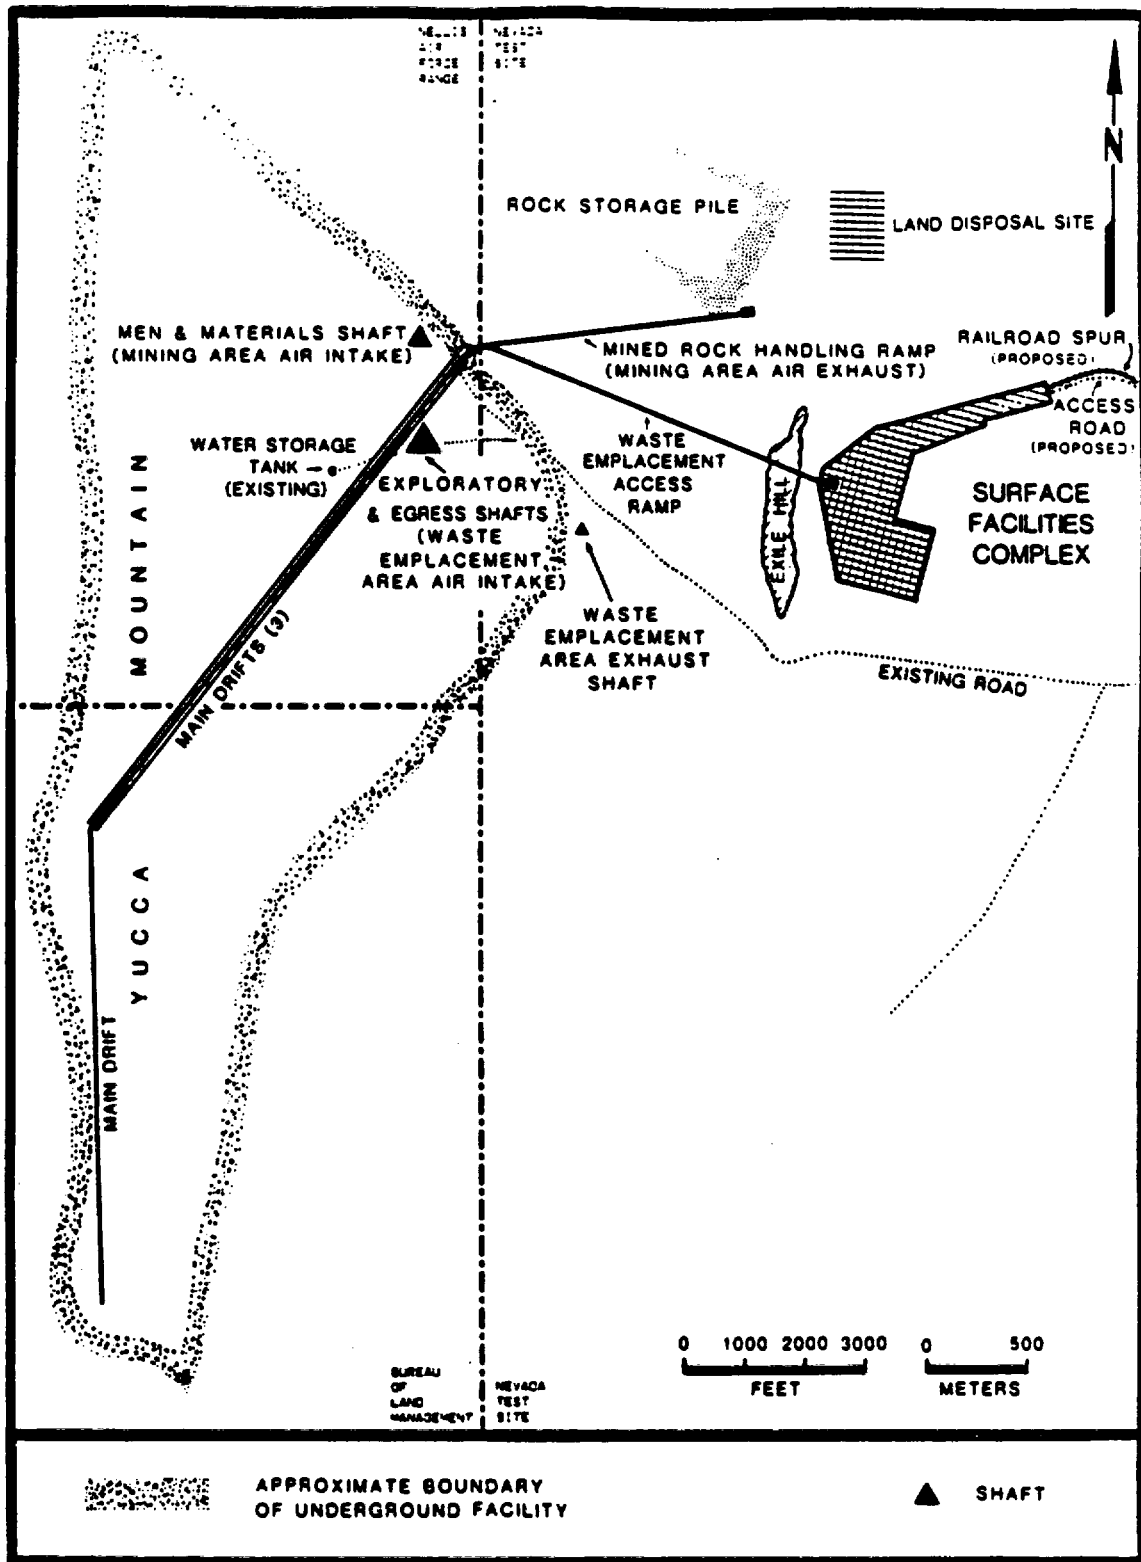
Two-stage repository site plan. Modified from MacDougall (1985).
